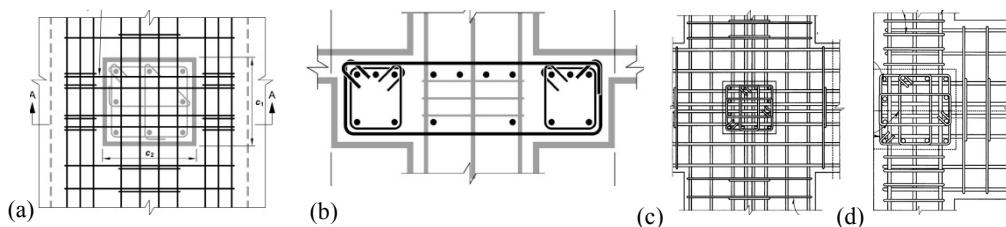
Arrangement of stirrups within wide beam-column connection according to ACI 318-08 (a, b) and ACI 352R-02 (c, d)
